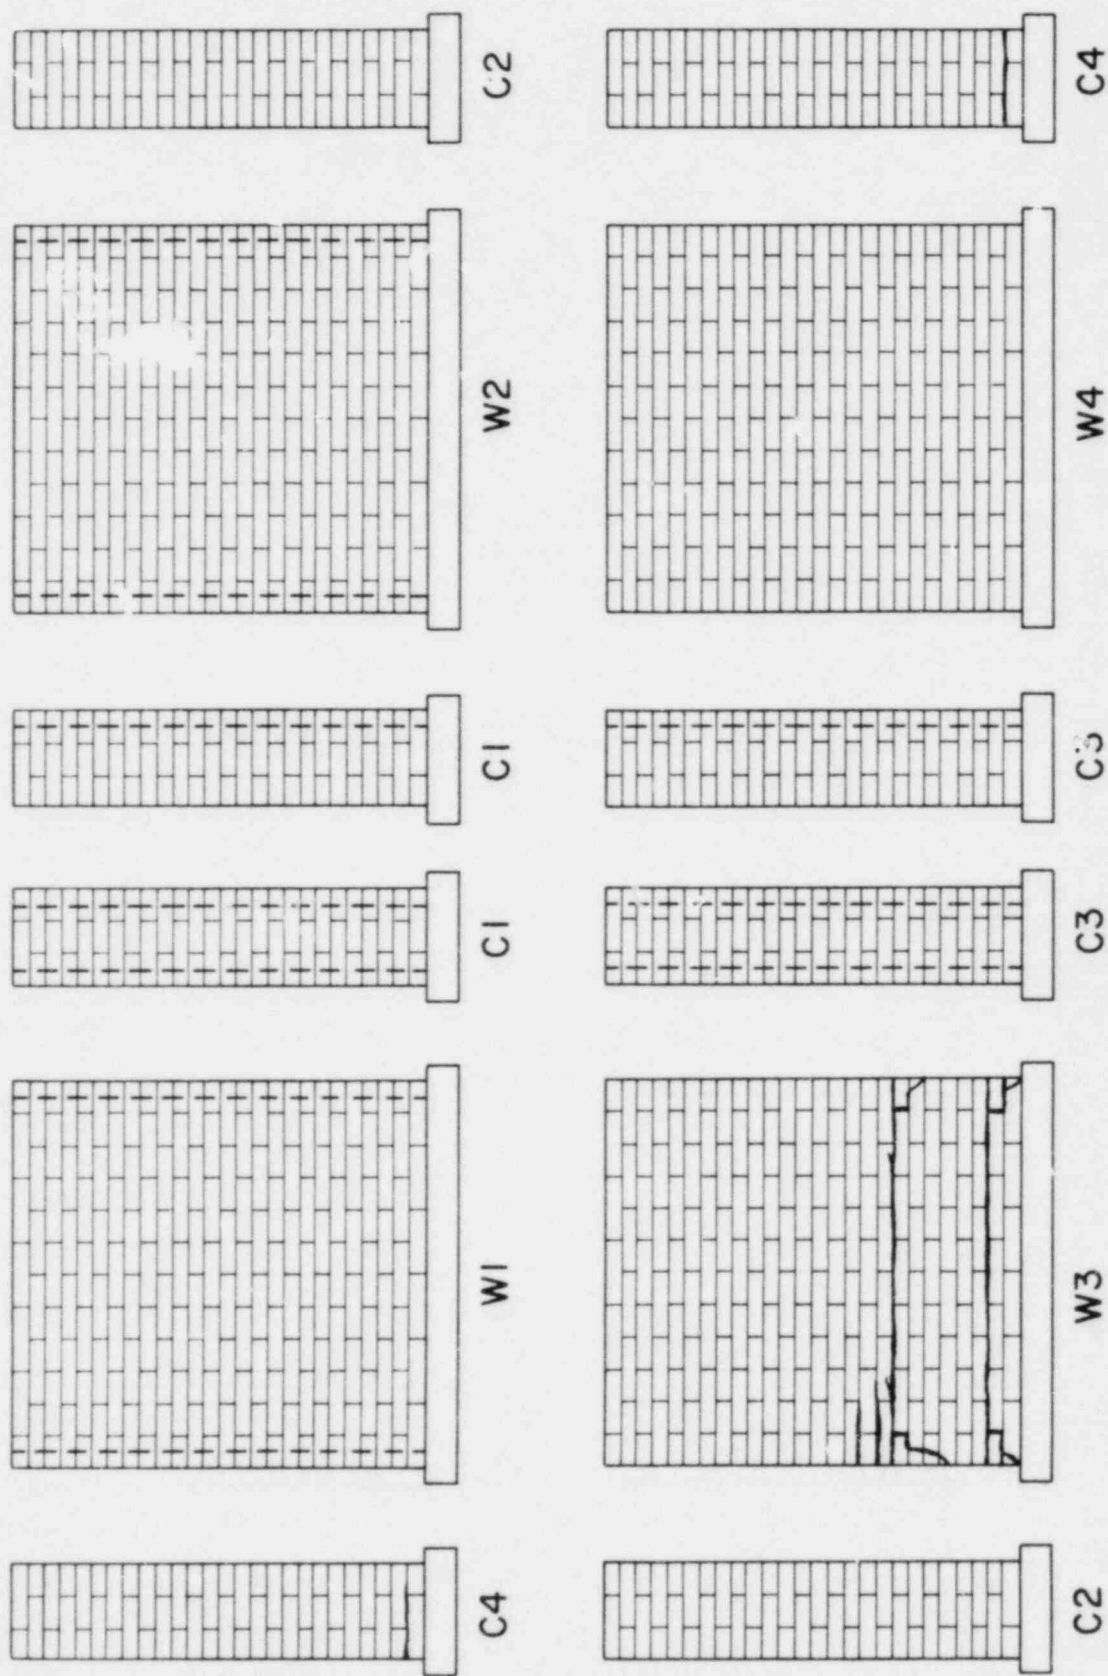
(3) DISTRIBUTION OF CRACKS IN THE MASONRY COMPONENTS: HOUSE 1, AFTER TEST 11 (TAFT - 0.29 g)
